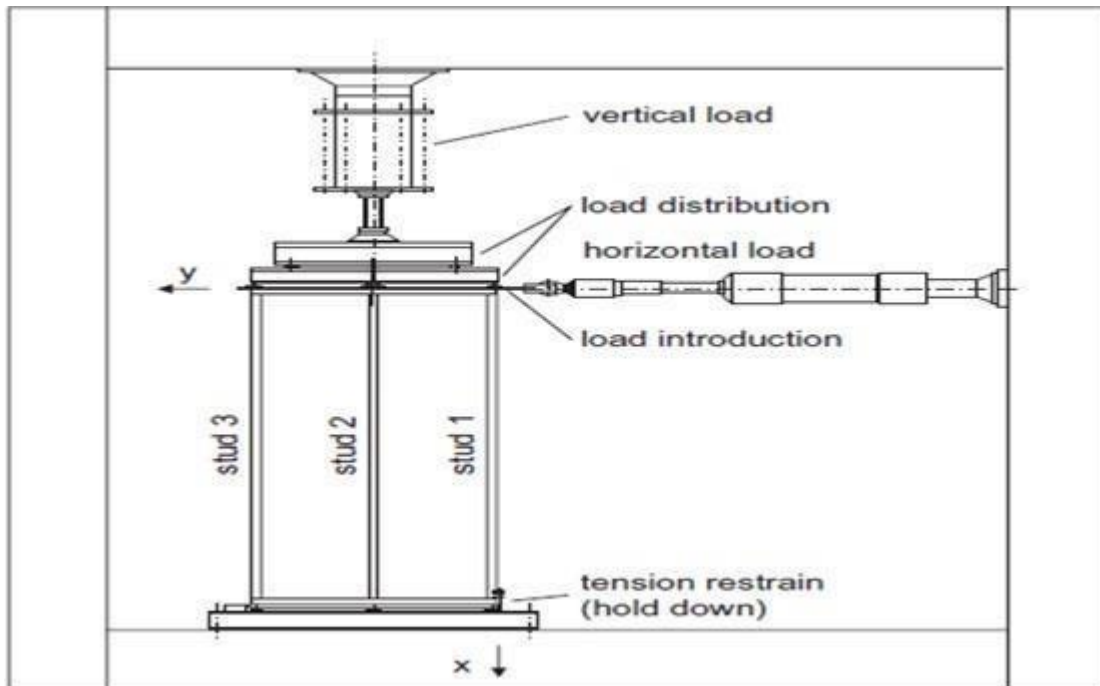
Test rig for walls under horizontal and vertical load. [10]
